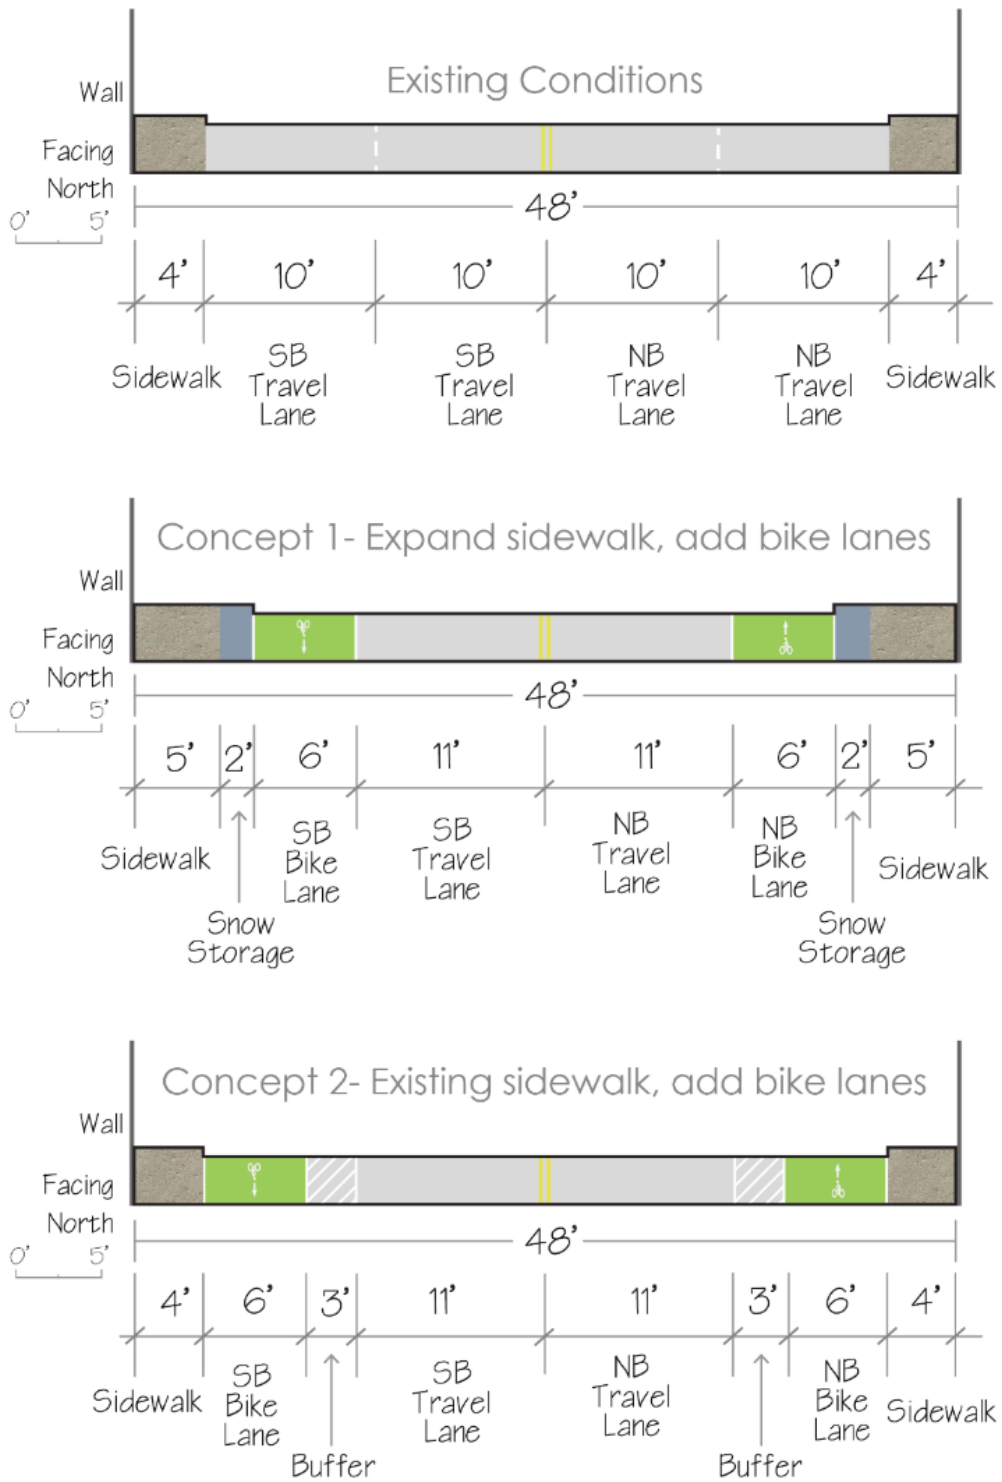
South Geddes Street/Erie Boulevard West Intersection Section Elevations, Concepts 1 & 2
